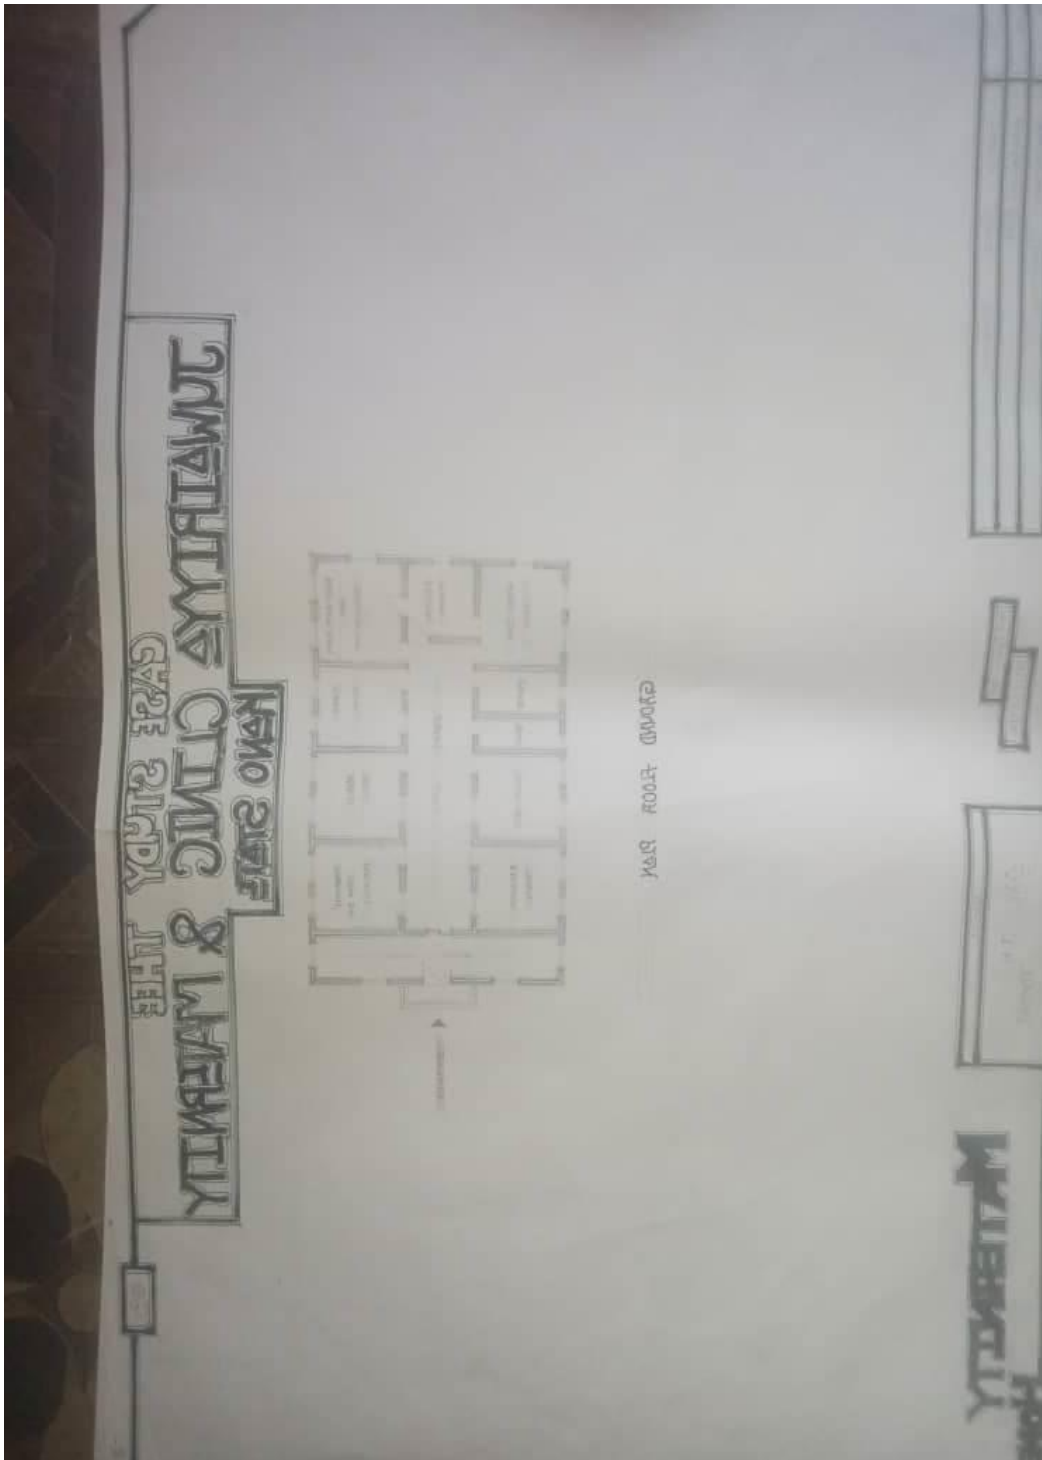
GROUND FLOOR PLAN OF CASE STUDY 3
